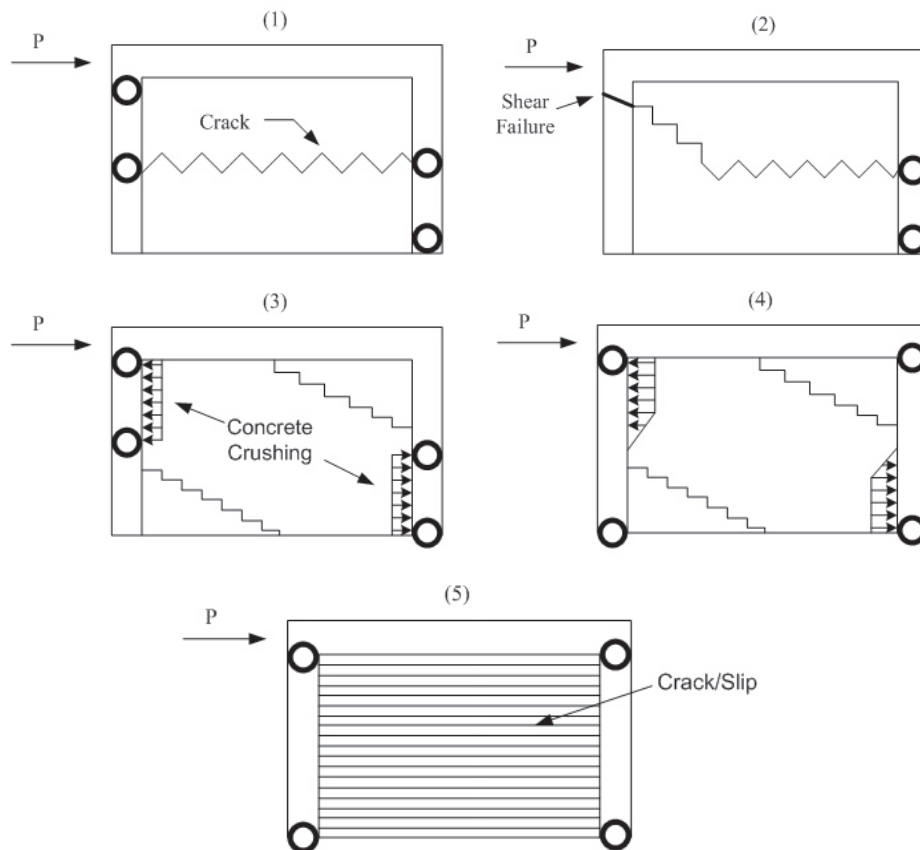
Failure Modes Caused by Infill Masonry
